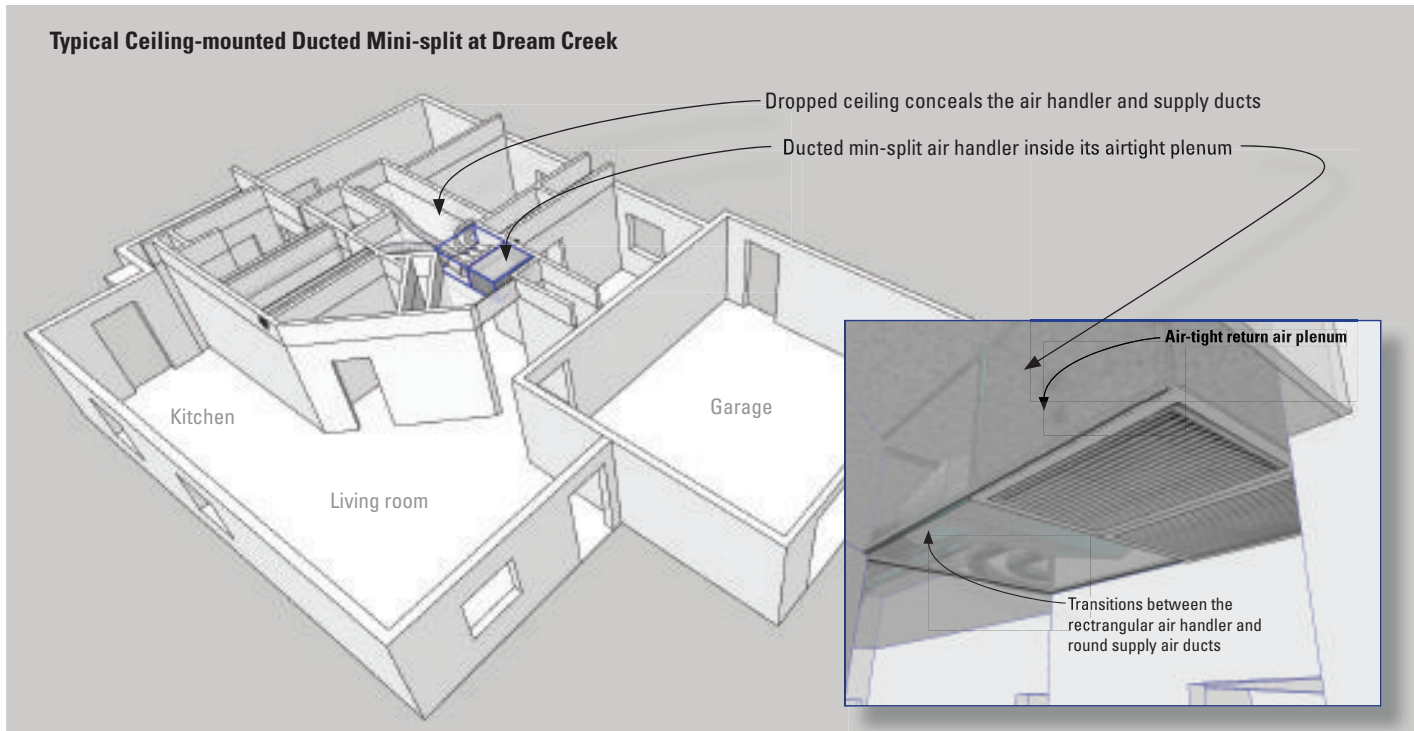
Ducted mini-split air handler above a dropped ceiling.
